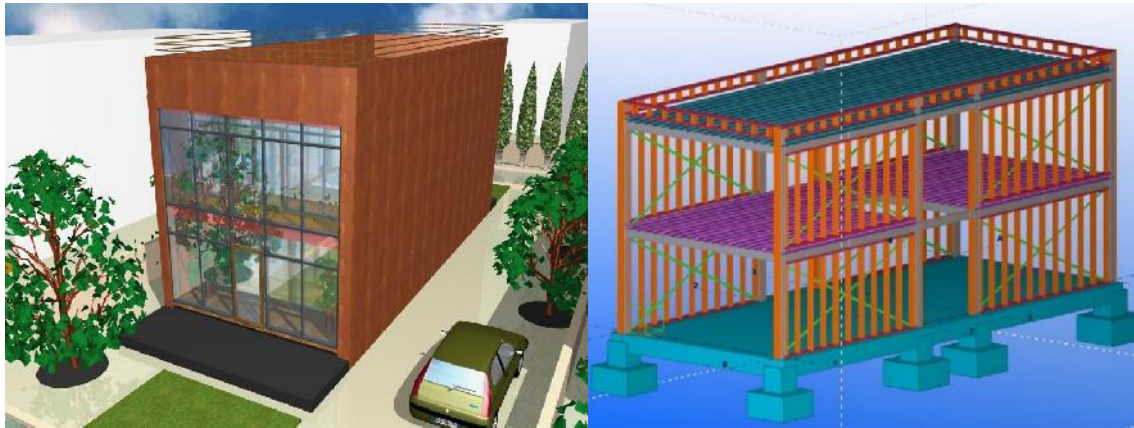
3D view of the house: (a) architectural layout; (b) structural layout
